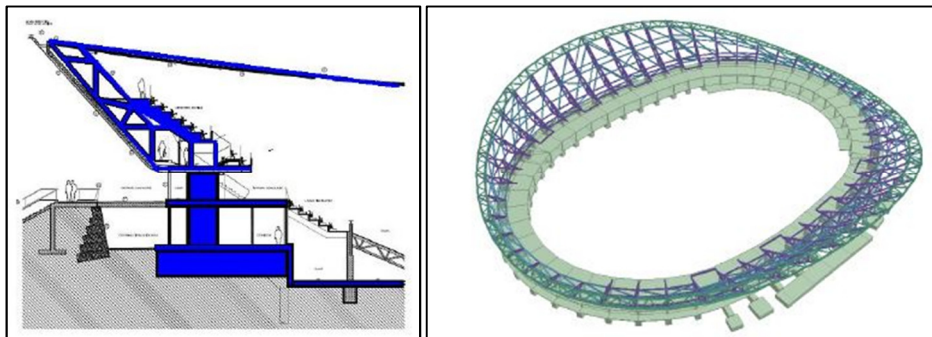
(a) Typical Section at main supporting structure / (b) 3D finite element model
